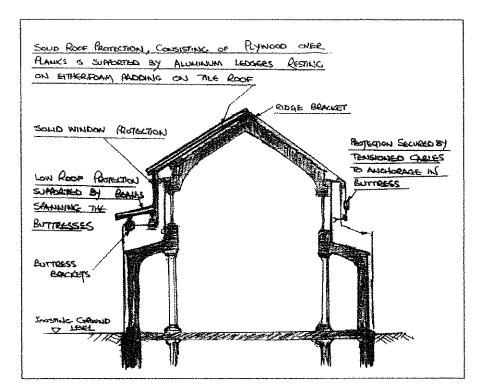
Before new construction was undertaken to the left of this church, a subcontractor was hired to design a protective system for the tile roof and clerestory windows. Drawing: Alan Shalders, Universal Builders Supply, Inc.
